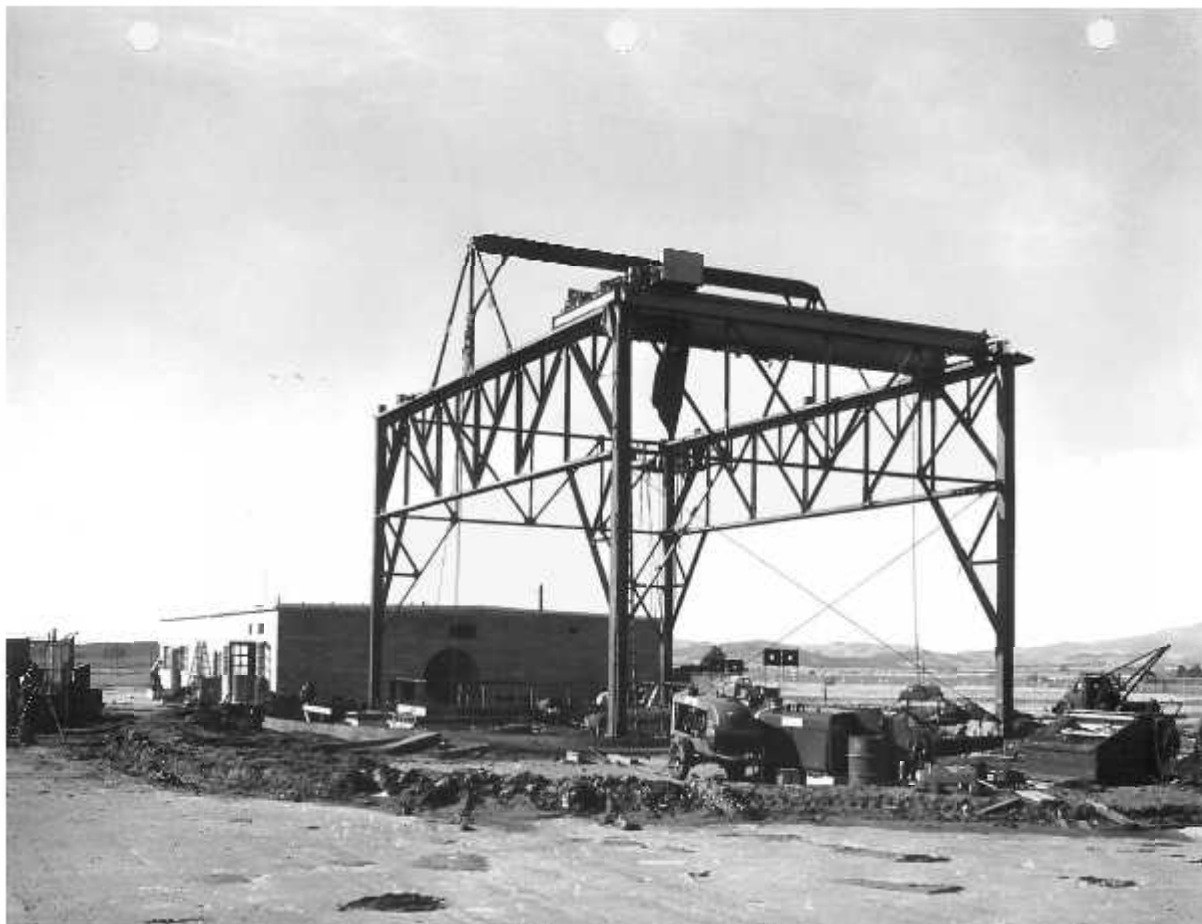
Construction of the 15-ton traveling crane, prior to the construction of Building 280, 1956. LLNL archives.
